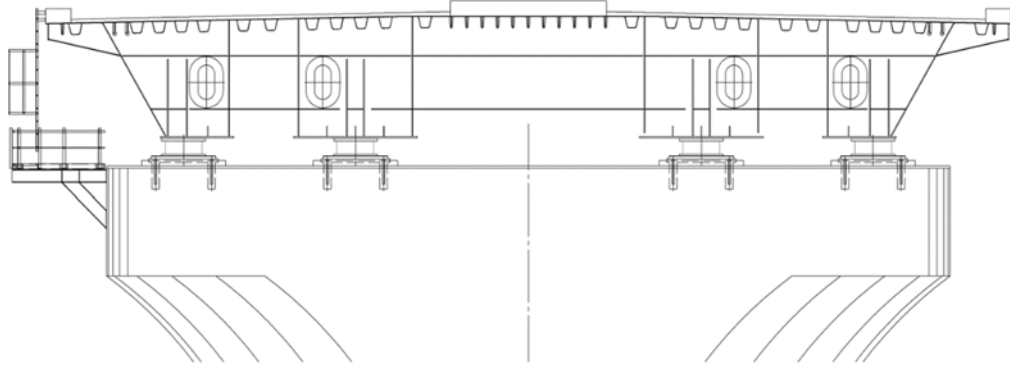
Fall Preventive Handrail at Pier Top
